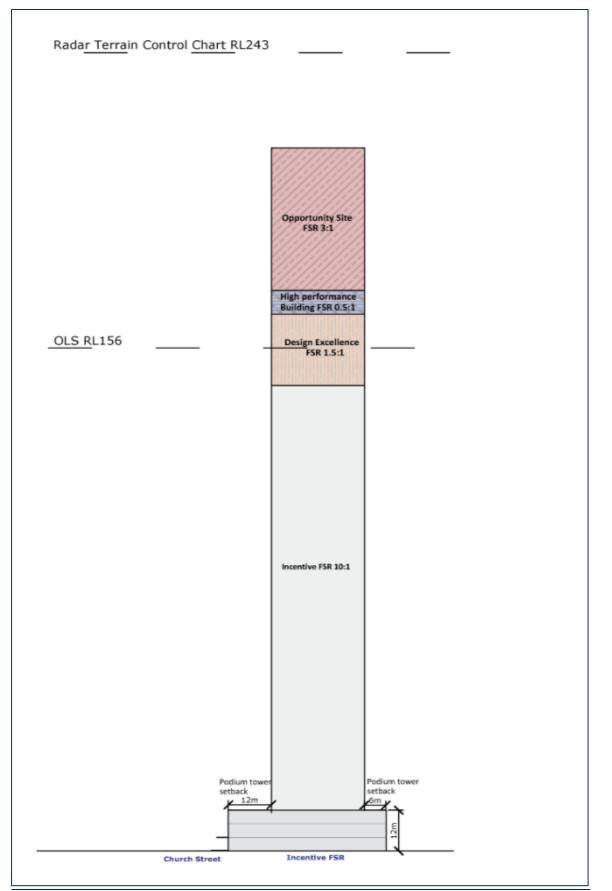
Possible building envelope permitted by the proposed planning controls – INDICATIVE ONLY AND NOT TO SCALE.
